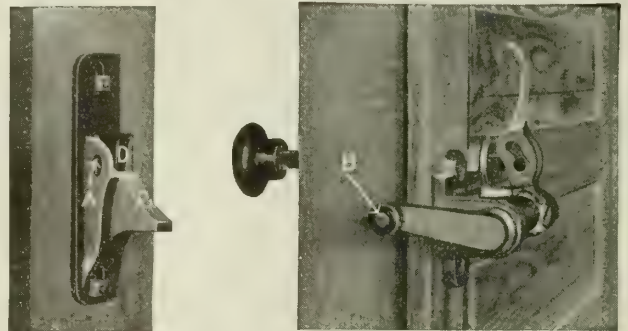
FIG. A shows how flat closure is secured; also, how Stevenson door frame sets in wall. Opening in wall should be  $3\frac{1}{2}$ " wider and  $4\frac{1}{2}$ " higher than clear size of doorway. (Follow construction Nos. 1 and 2.) Overhead track doors require rough opening extending 11" above upper edge of track; the overhead track "door that can not stand open," 12" above. Door frames are secured with lag screws  $\frac{3}{8}$ " x 4", inserted through front casing at A. Set door frame to conform to door, not to conform to wall.
